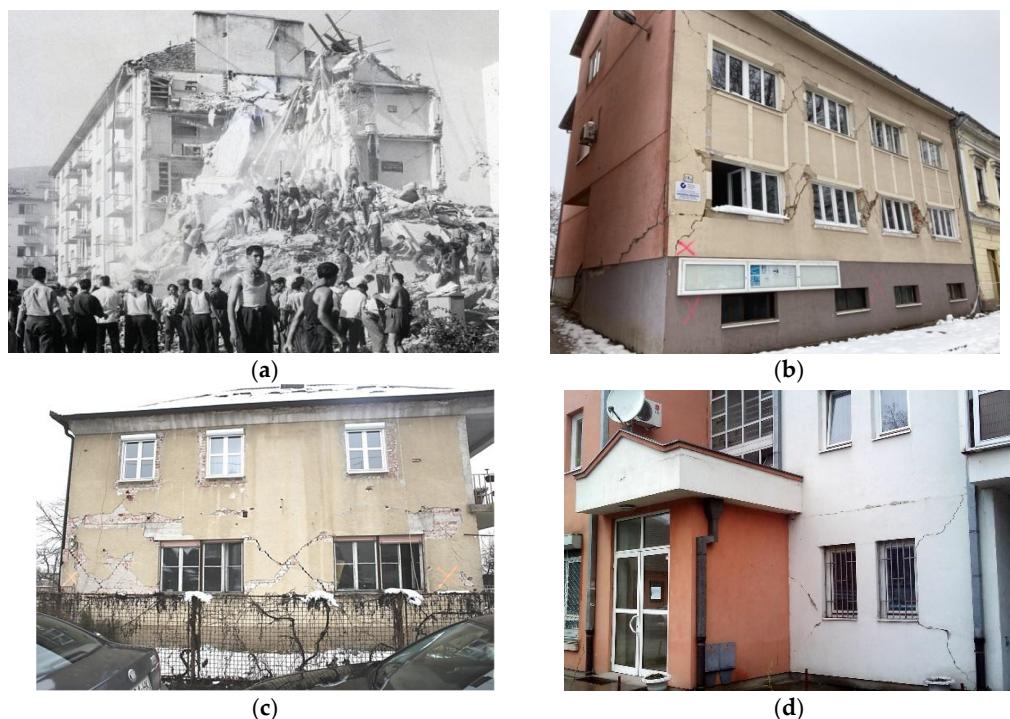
Seismic performance (DSs) of URM residential buildings in past earthquakes in the Balkan region: (a) DS5—a collapsed building in Skopje due to the 1963 Skopje earthquake (credit: Z. Miliutinović); (b) DS4—an URM building in Petrinja experienced extensive cracking in wall piers due to the 2020 Petrinja earthquake (credit: SUZI-SAEE); (c) DS3—an URM building in Petrinja experienced a major shear-induced cracking in piers at the ground floor level due to the 2020 Petrinja earthquake (credit: SUZI-SAEE), and (d) DS2—a moderately damaged URM building which experienced moderate shear-induced cracking due to the 2010 Kraljevo earthquake (credit: P. Blagojević).
